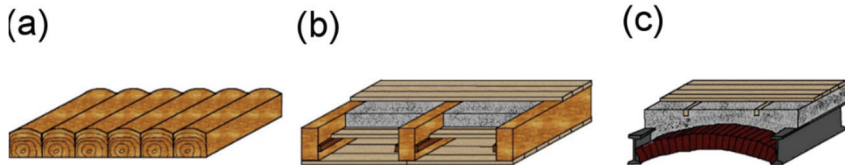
Floor structures used until the 19th century: (a) Timber floor with joists without spacing; (b) Classic timber floor with timber joists with spacing; (c) Vaults between iron beams (redrawn from:[7])
